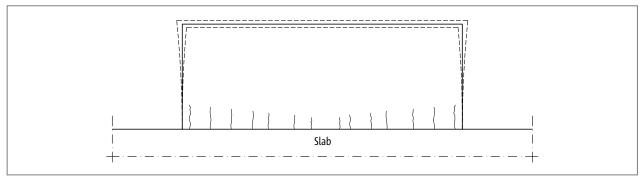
Balcony slab without Schöck Isokorb®: Crack formation through fatigue possible
